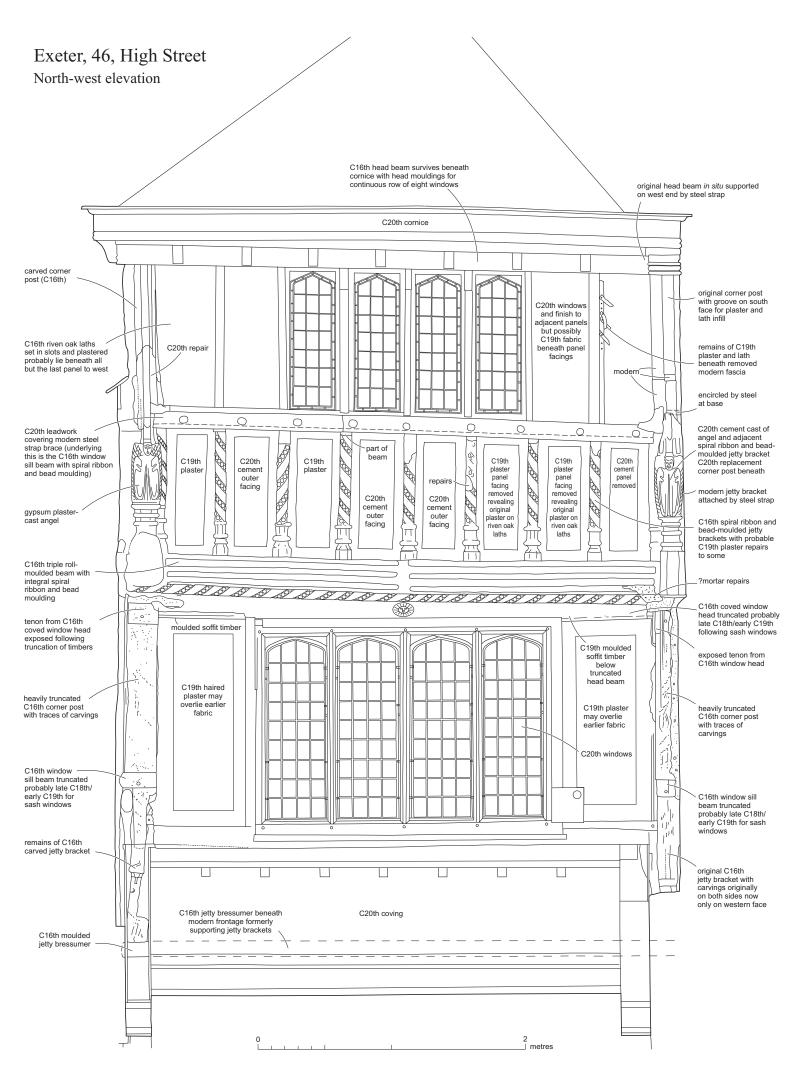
Front elevation of No. 46 showing existing exterior features. Scale 1:20.
